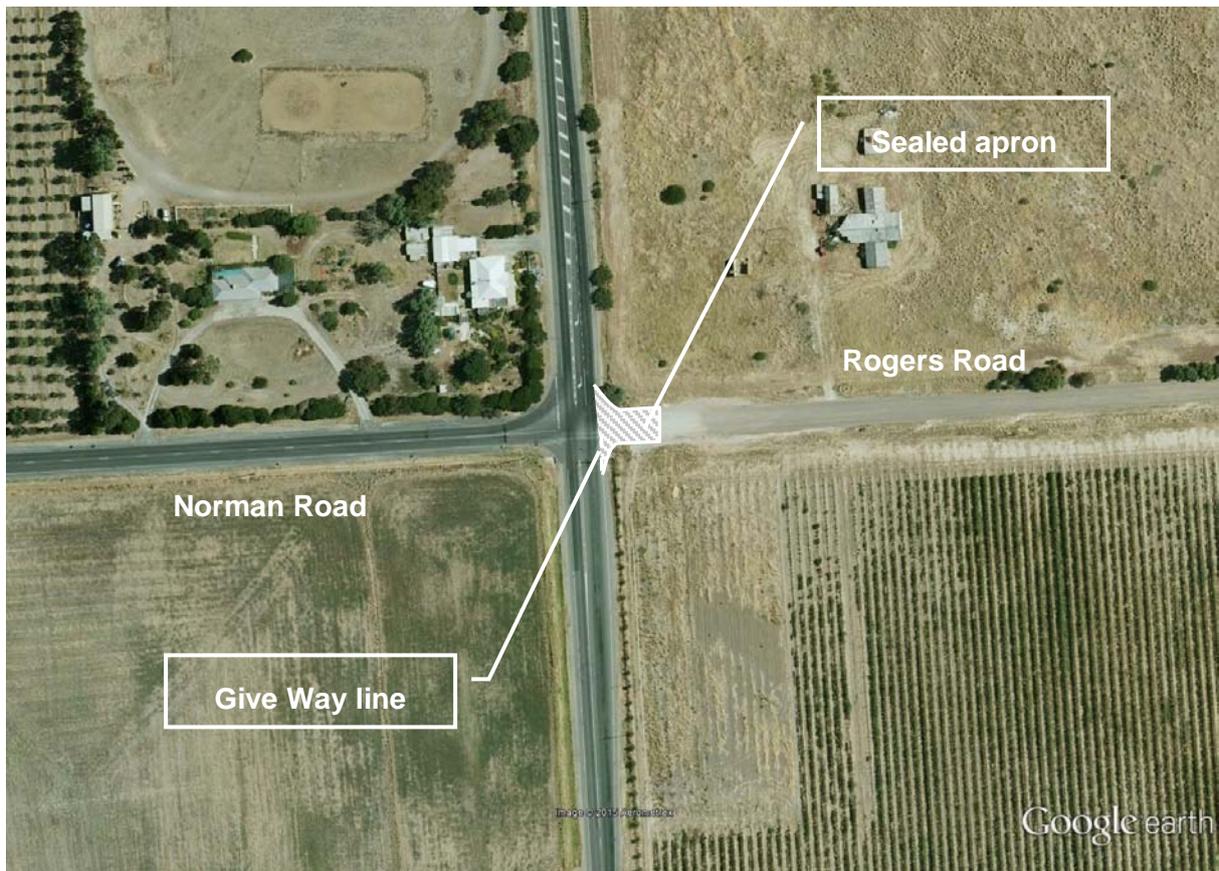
Proposed Upgrades for Norman Road/Rogers Road Intersection: Sealed apron and Give Way line
